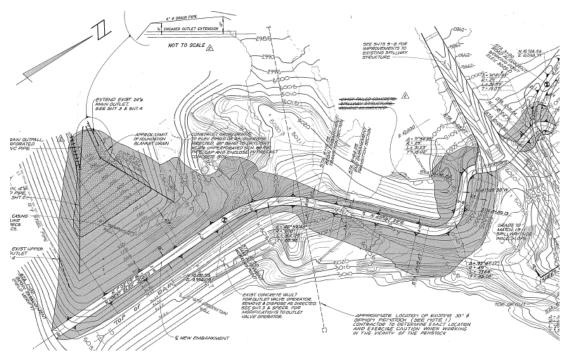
Plan of embankment dam, dike embankment, and chute spillway.
